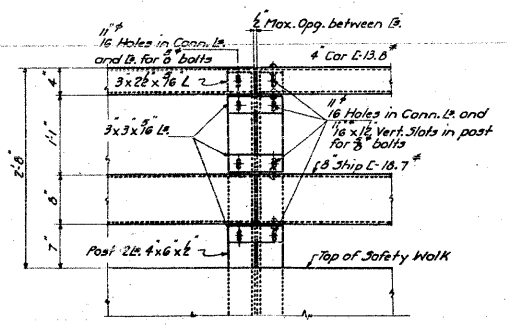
DETAIL A CONNECTION AT INTERMEDIATE DIAPHRAGMS
